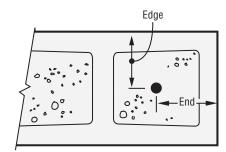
Anchor Installed in Cell Opening (Top of Wall)
